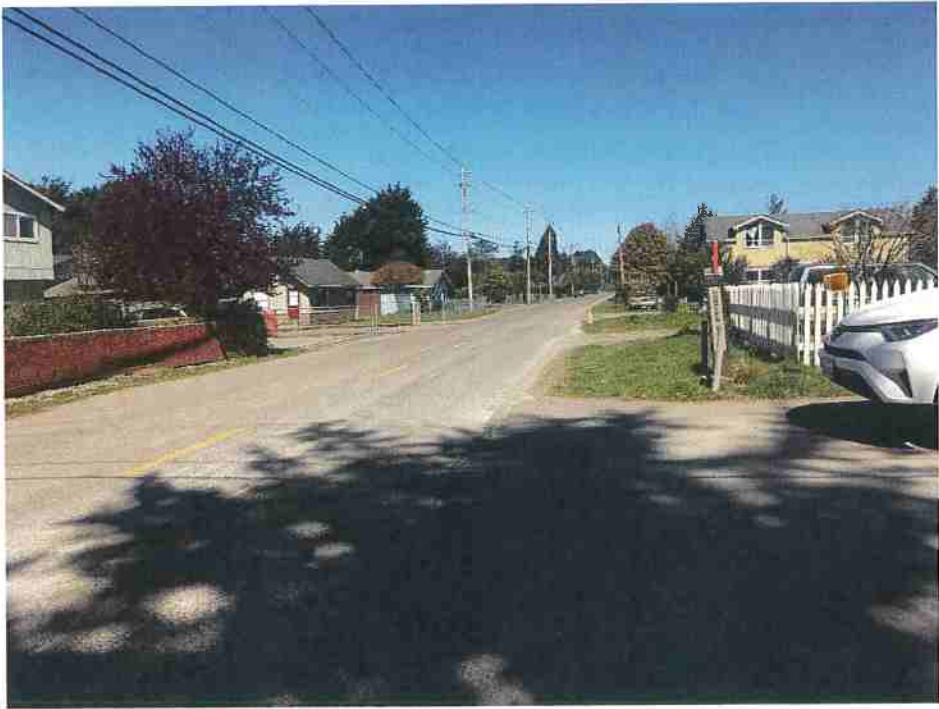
RP 1. Intersection of Dows Prairie Road and Hooven Road, Paved apron 36' in width. Image taken at gate facing north.
